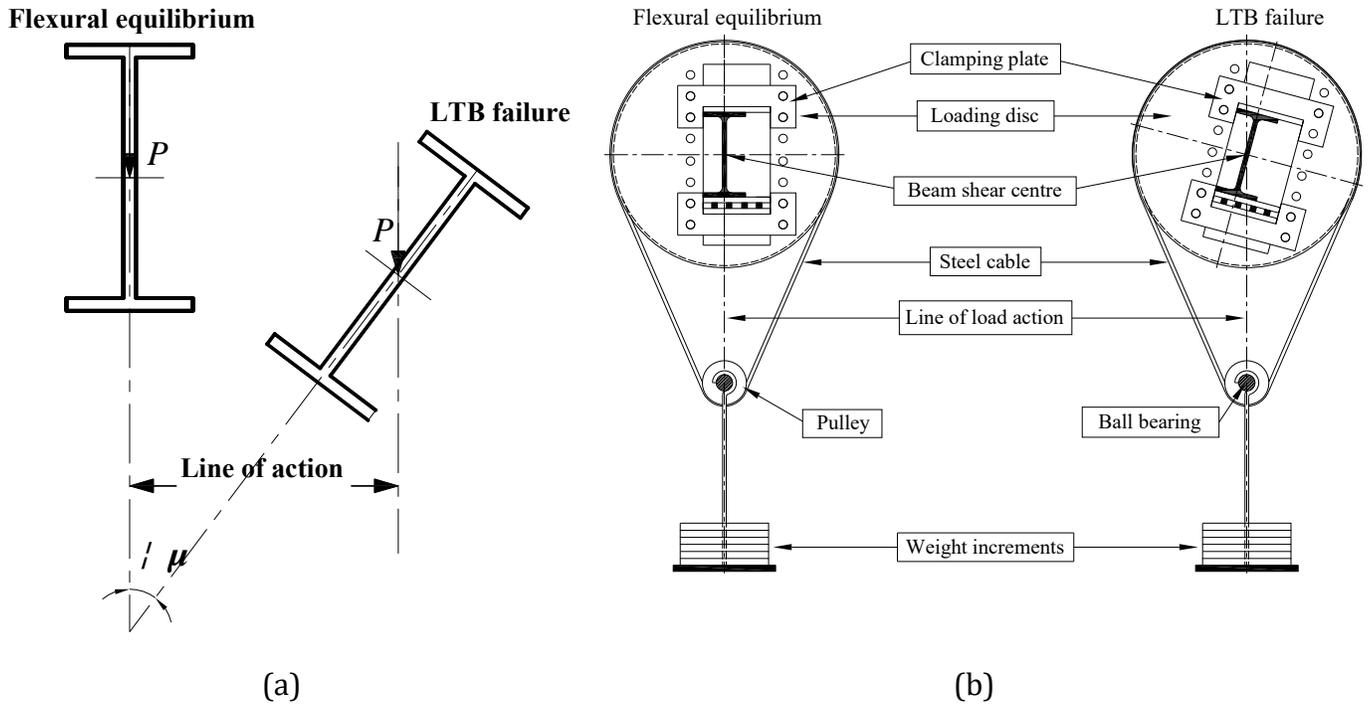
(a) LTB theoretical loading requirements; (b) schematic set-up of the loading fixture.
